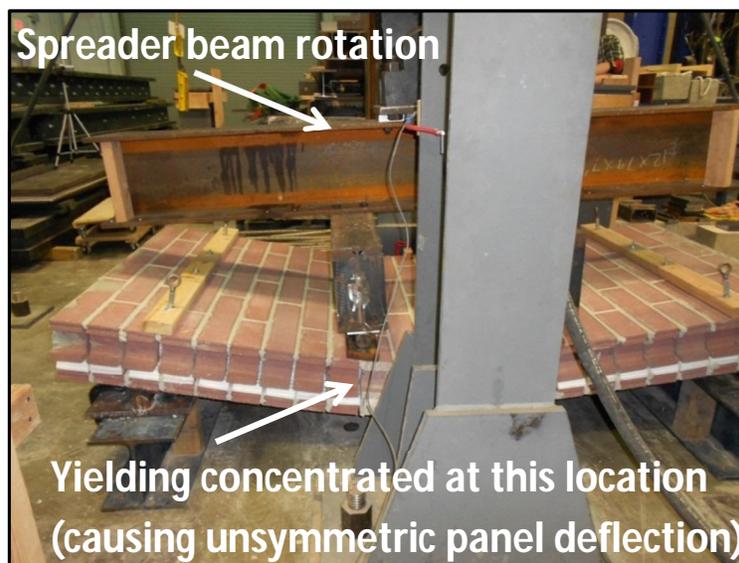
Unsymmetrical Loading Toward End of Wall 2 Test
